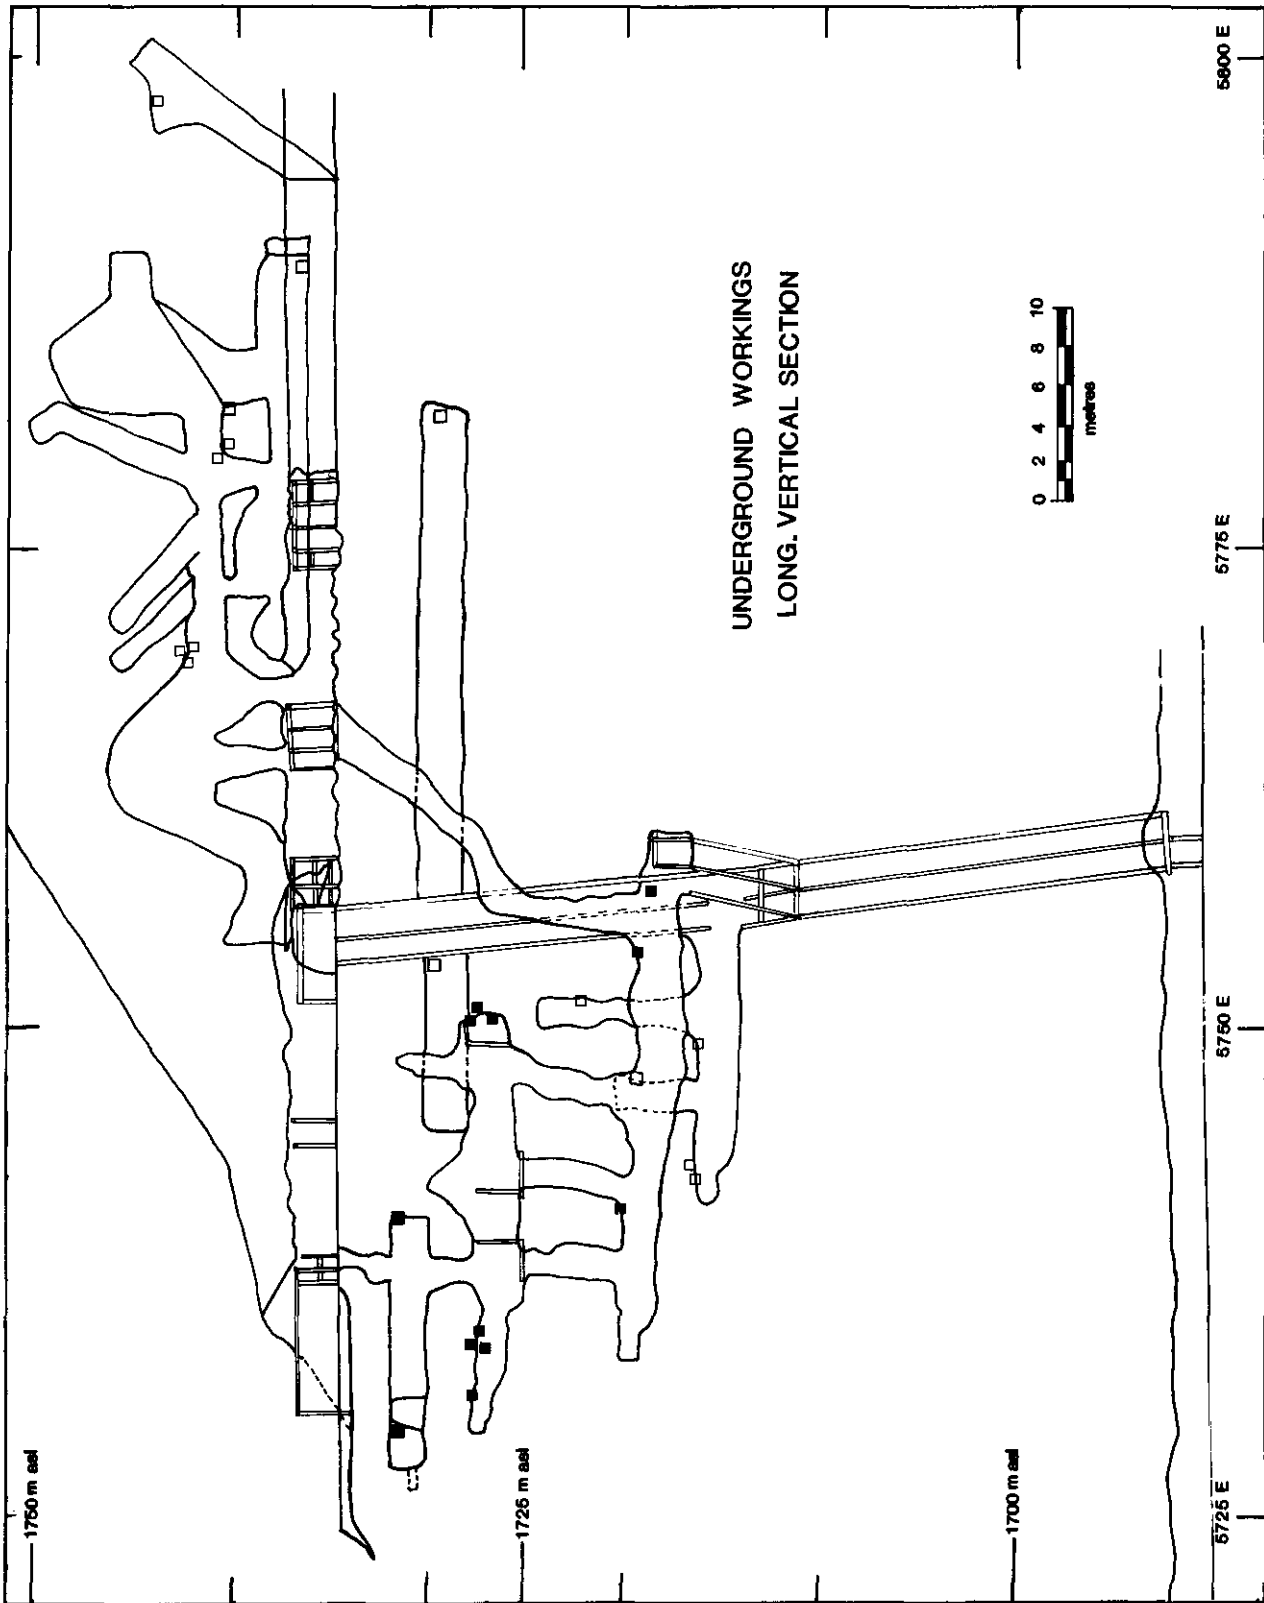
Longitudinal vertical section. Hallmac mine, Sandon, showing vertical and horizontal distribution of petrographic samples; hangingwall (■) and footwall (□).
